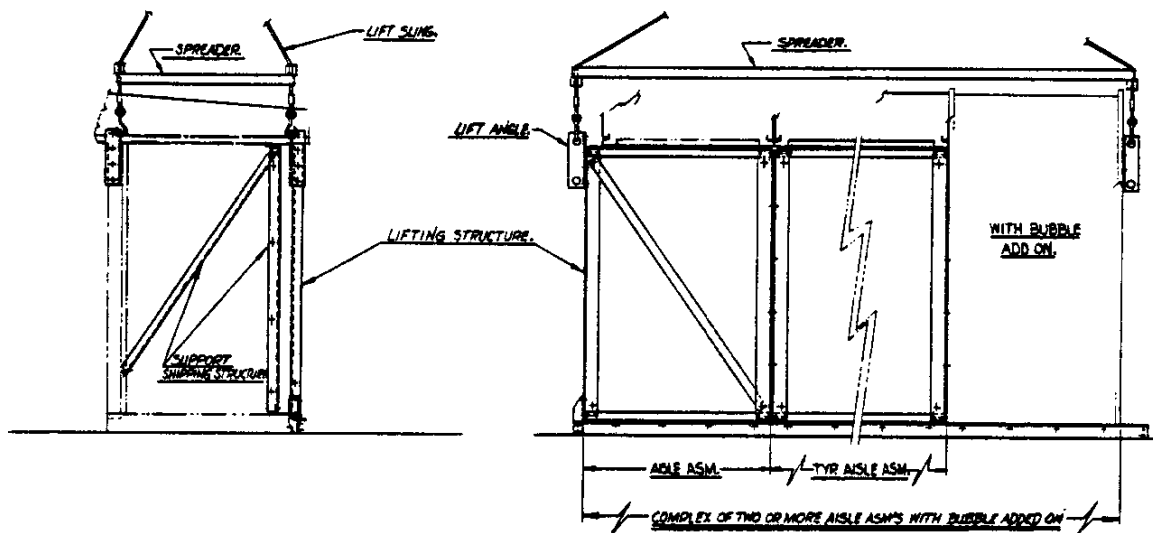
Installation Details for Outdoor Power/Vac* Metal-clad Switchgear (continued)
